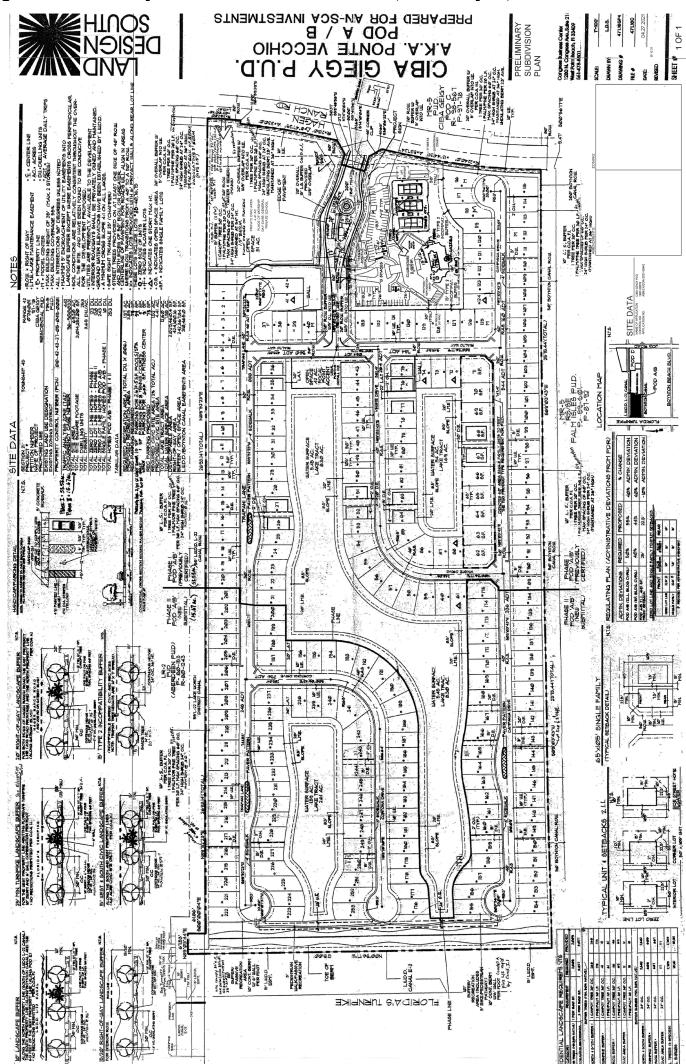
Preliminary Subdivision Plan Pods A and B, dated July 12, 2021
